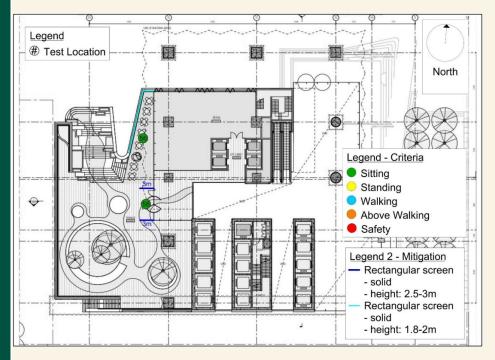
Elevated public plaza Mitigation Measures (Source: MEL)
